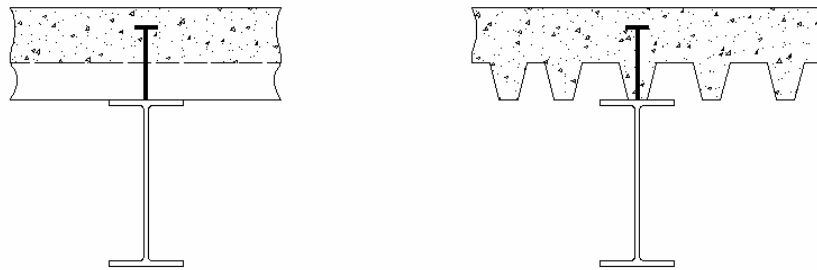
Left: Composite beam with concrete slab, Right: Composite girder and slab
